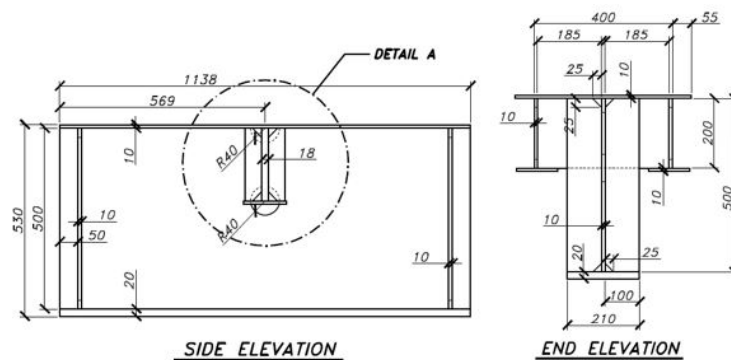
Left: Side elevation and Right: End elevation of the test specimen [10] [9]
